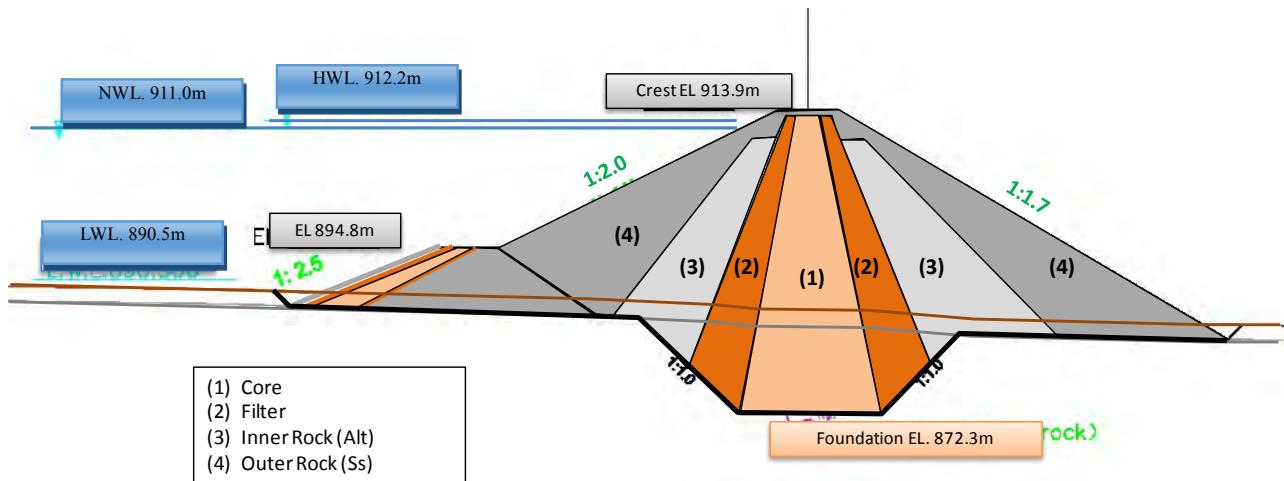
Typical Cross Section of Rockfill Dam (H=41.6m, No. 1 +20.0m)
